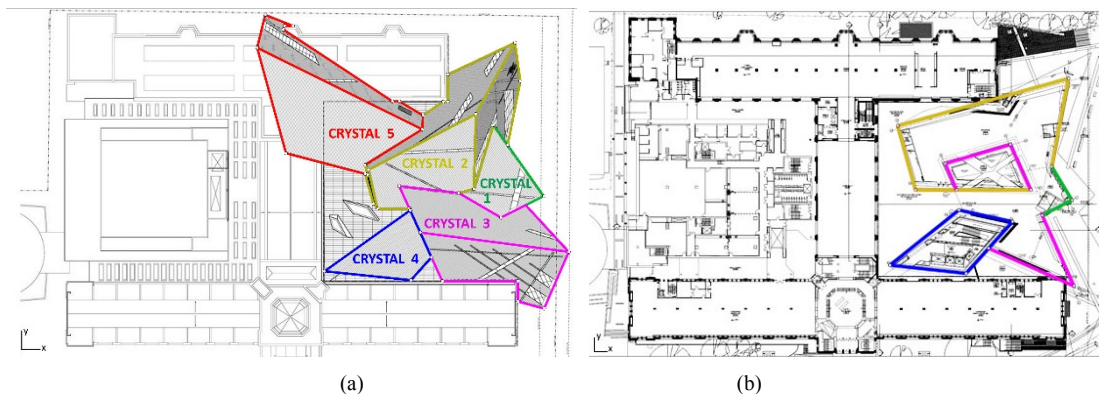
(a) Site plan of the model, the xy-plane, and (b) Ground floor plan of the model, the xy-plane
